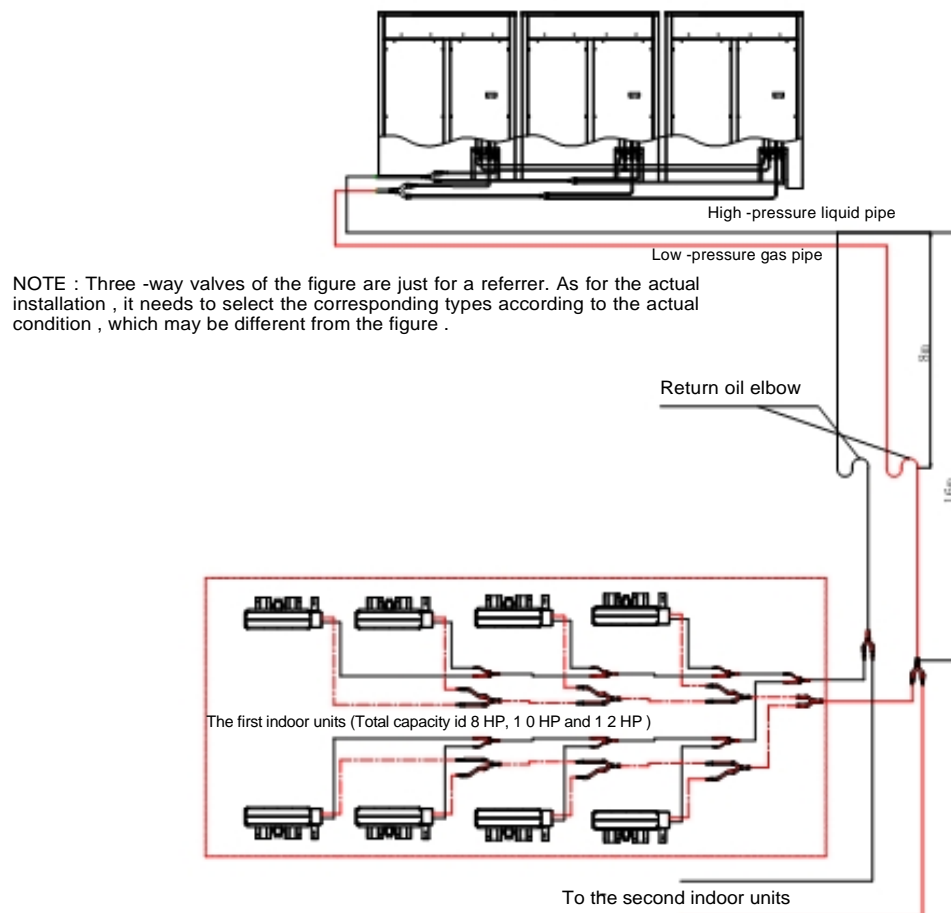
8 : Design drawing of return oil elbows -Upright Direction
